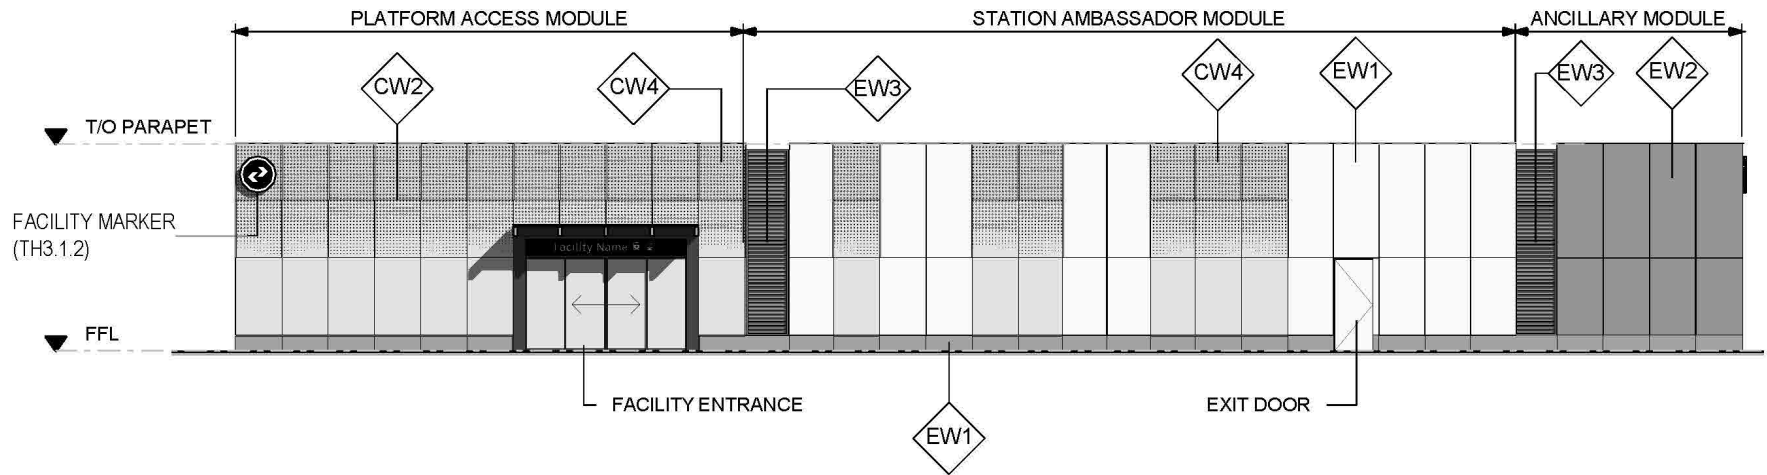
Staffed Station building (Tunnel platform access) Plaza Elevation, showing exterior finishes, Platform Access, Station Ambassador and Ancillary Modules
